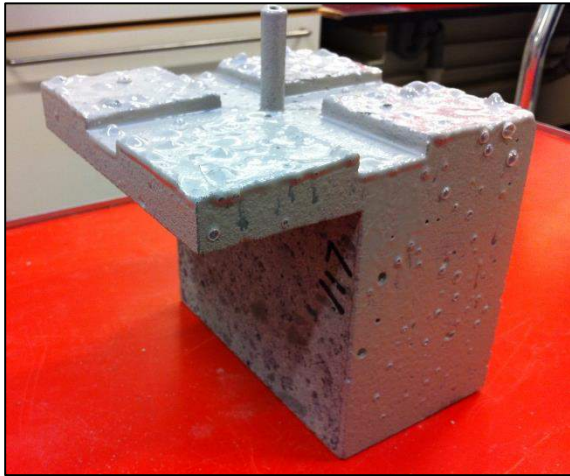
Concrete specimen after coating with the first layer of epoxy resin.
